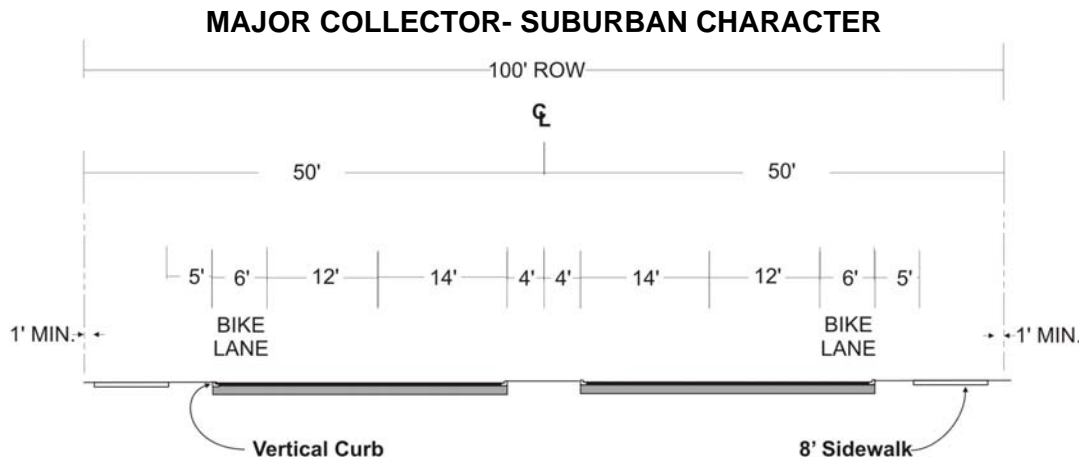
ROADWAY CROSS SECTIONS (Continued)
